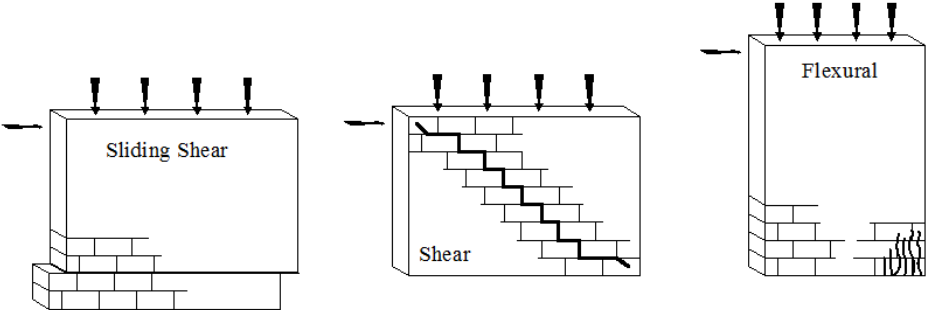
In-plane failure pattern of masonry walls (Tomažević, 1999)
